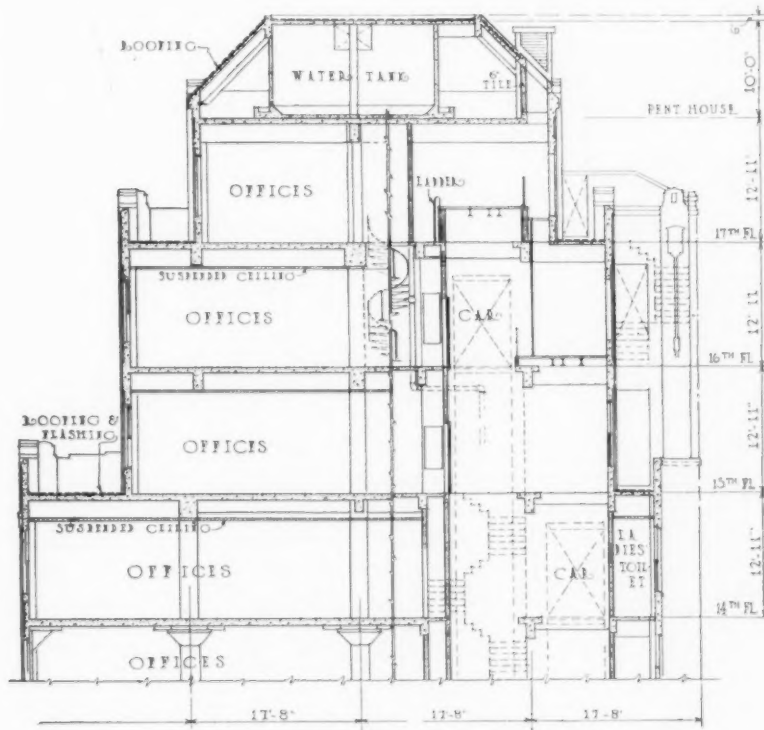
Section through Upper Stories Showing Concrete Water Tank and Portion of Load Carried on 15th Floor Slab
